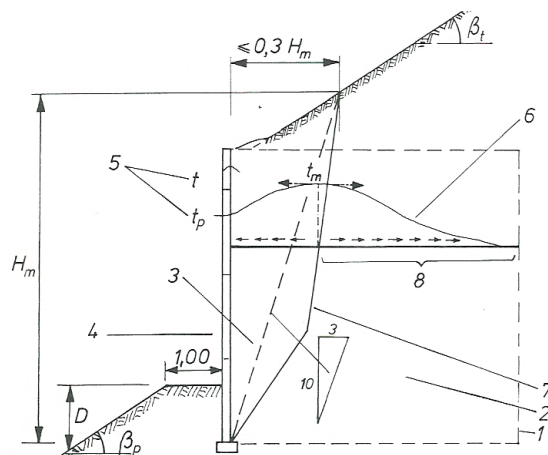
Design diagram for reinforced soil structure: 1 – reinforced soil mass, 2 – reinforcing insert anchoring zone, 3 – active zone of reinforced soil, 4 – casing of the front of the structure, 5 – tensile values of the reinforcement insert (t – to the length of the insert, t_p – at the joint of the insert with the casing of the retaining wall), 6 – distribution of tensile forces along the length of the reinforcement insert, 7 – line of maximum tensile strength at the height of the retaining wall, dividing the massif into active and passive zones, 8 – length of the insert's anchoring, D – depth of the massif's foundation, $D \geq 0.4$ m – basic depth, $D = 0$ – when the structure is supported on a rock or concrete bench
